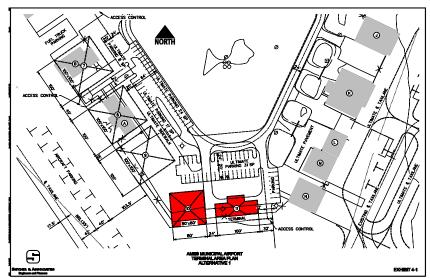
Ames Airport Master Plan (Ch 4, Exhibit 4-1)
